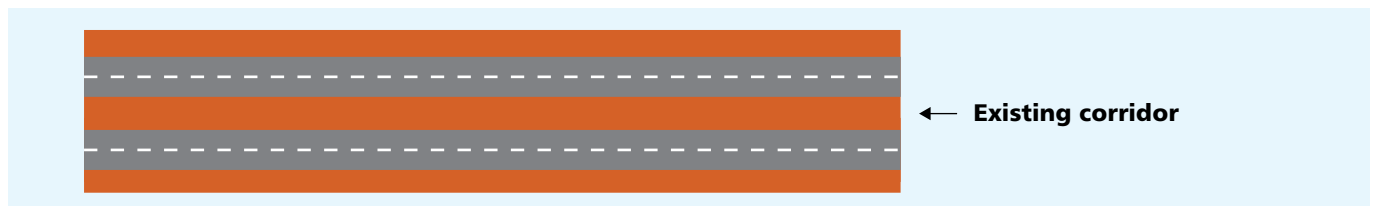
Upgraded road alignment or carriageway duplicated within existing road corridor
